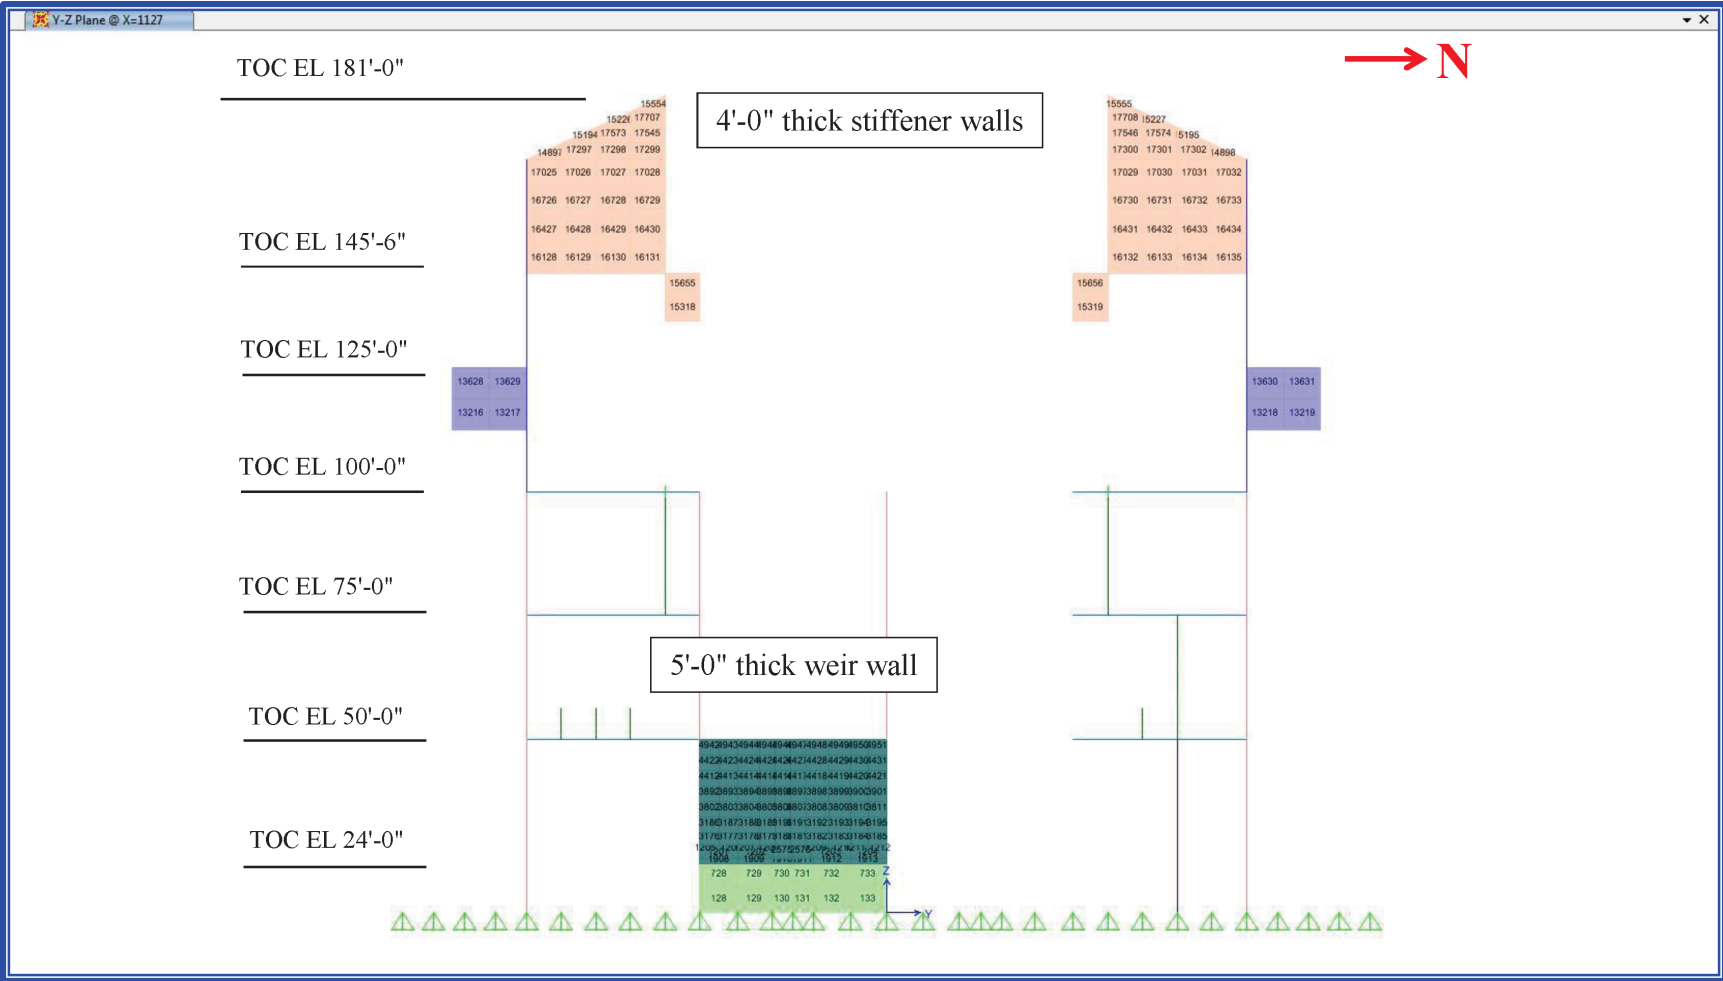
B-11: RXB Reinforcement Elevation at Grid Line 3 Wall
